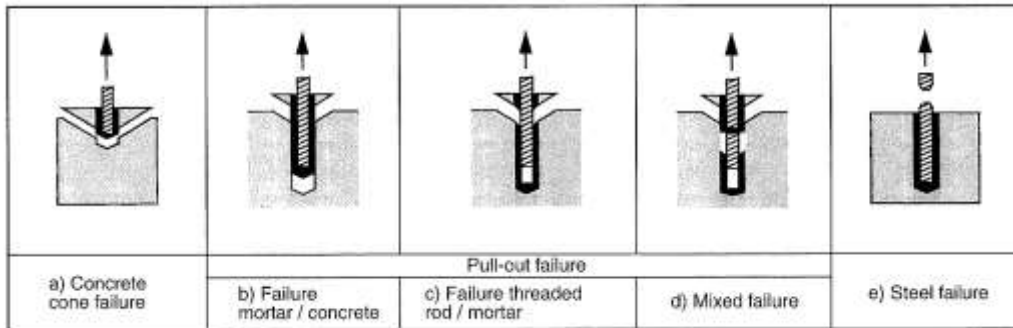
Failure mechanism of adhesive anchor systems (Cook et al, 1998)
